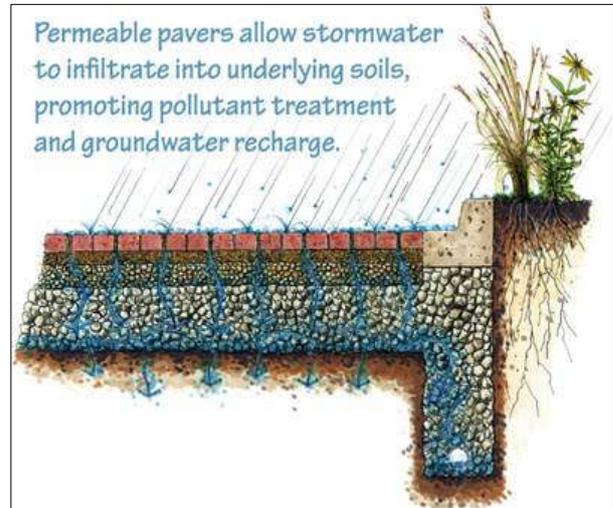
Cross-section of possible implementation of permeable paving in the walkway.
